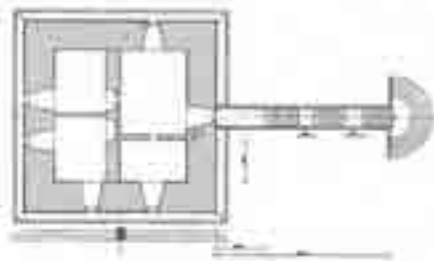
Santa Maria Dell'Alto Tower, Nardò (Lecce), truncated-pyramid shaped tower provided with external staircase.
